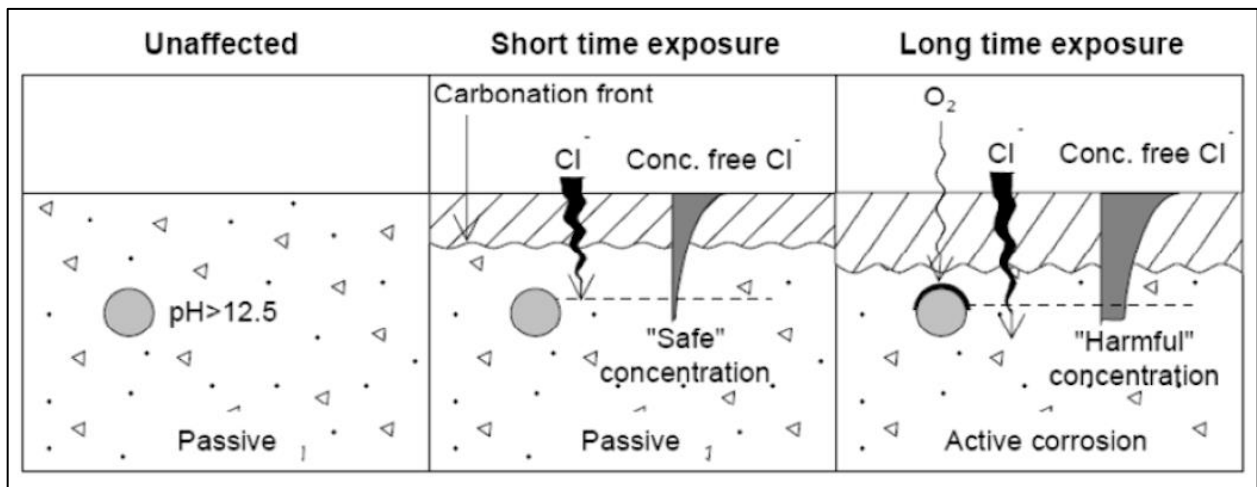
Chloride Ion Infiltration to Rebar Steel (AIMS Press 2018)
